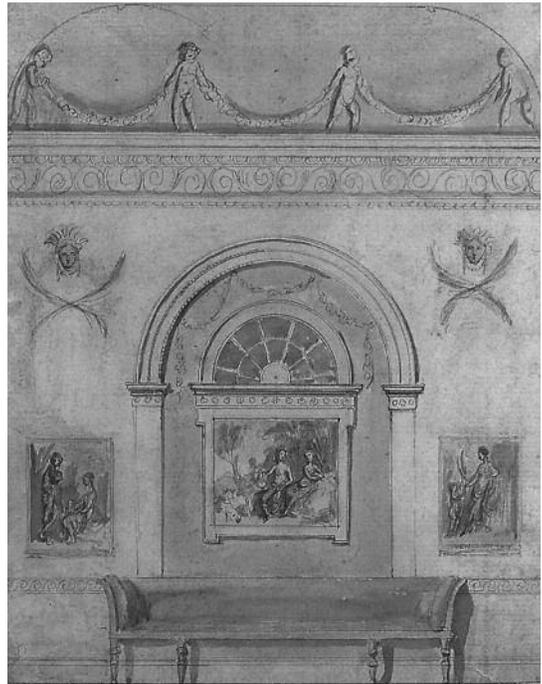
James Stuart, drawing of Lady Spencer's Closet at Wimbledon House, Surrey. *RIBA, Drawings Collection.
